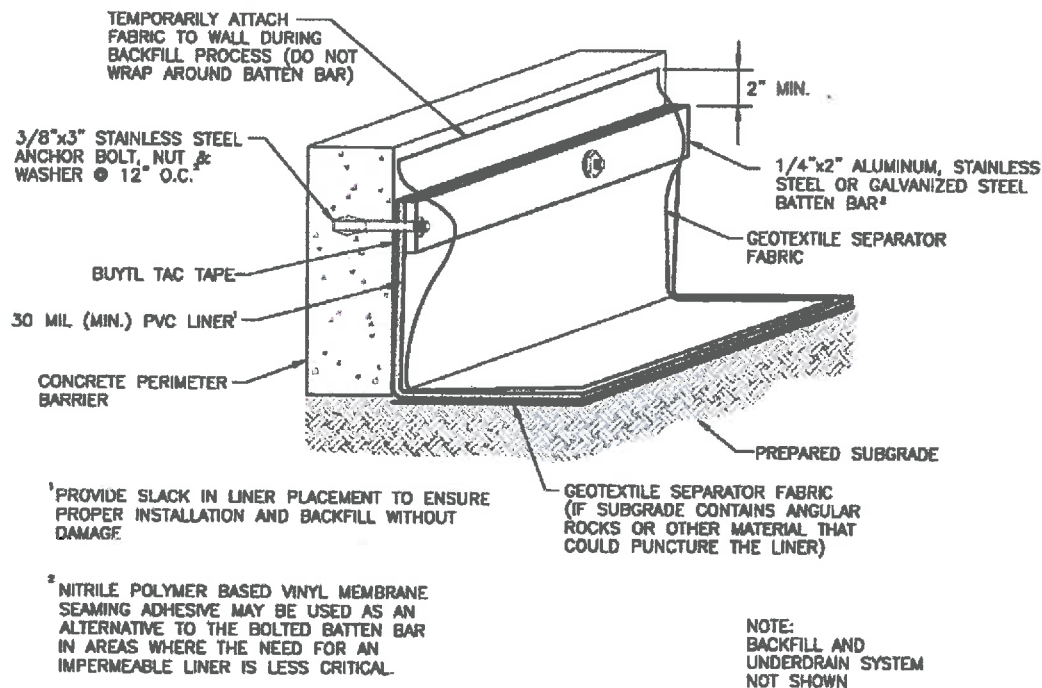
Geomembrane Liner/Concrete Connection Detail
